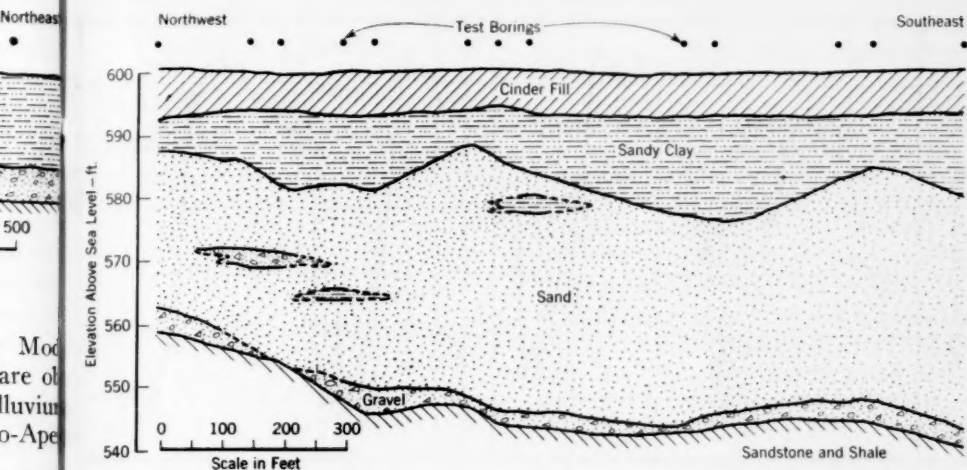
Geologic Section Along Foundation of Bridge at South Charleston, W.Va.
